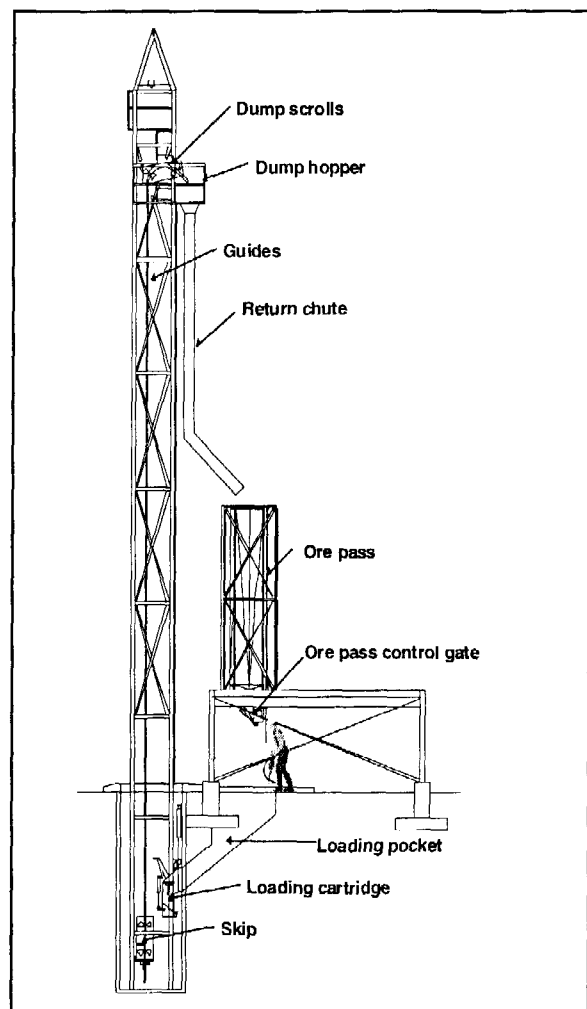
Layout of one-third-scale hoist and ore pass test facility
